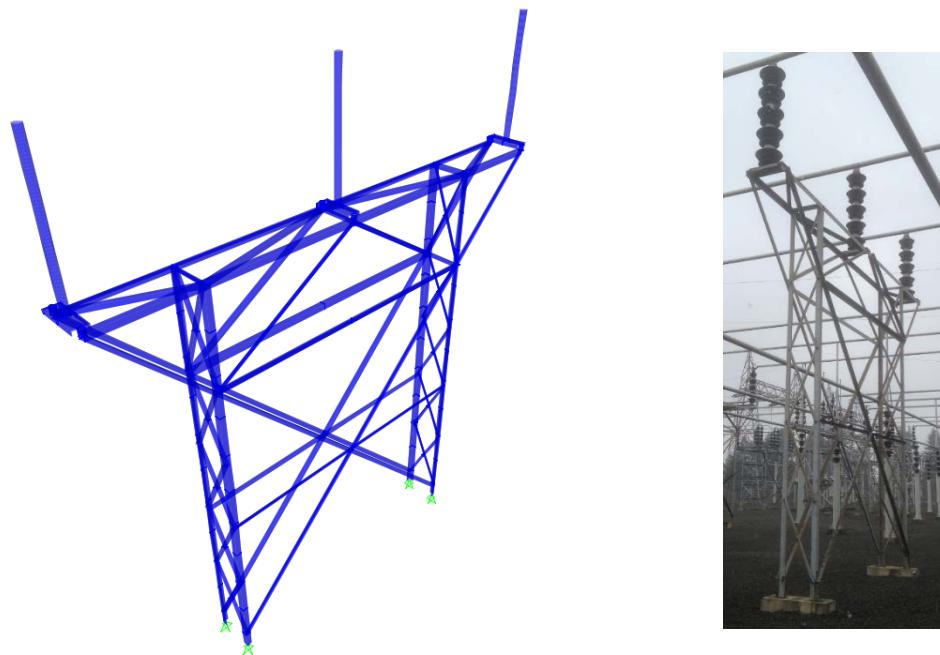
Insulator Lattice Subassembly – 230 kV Bay
